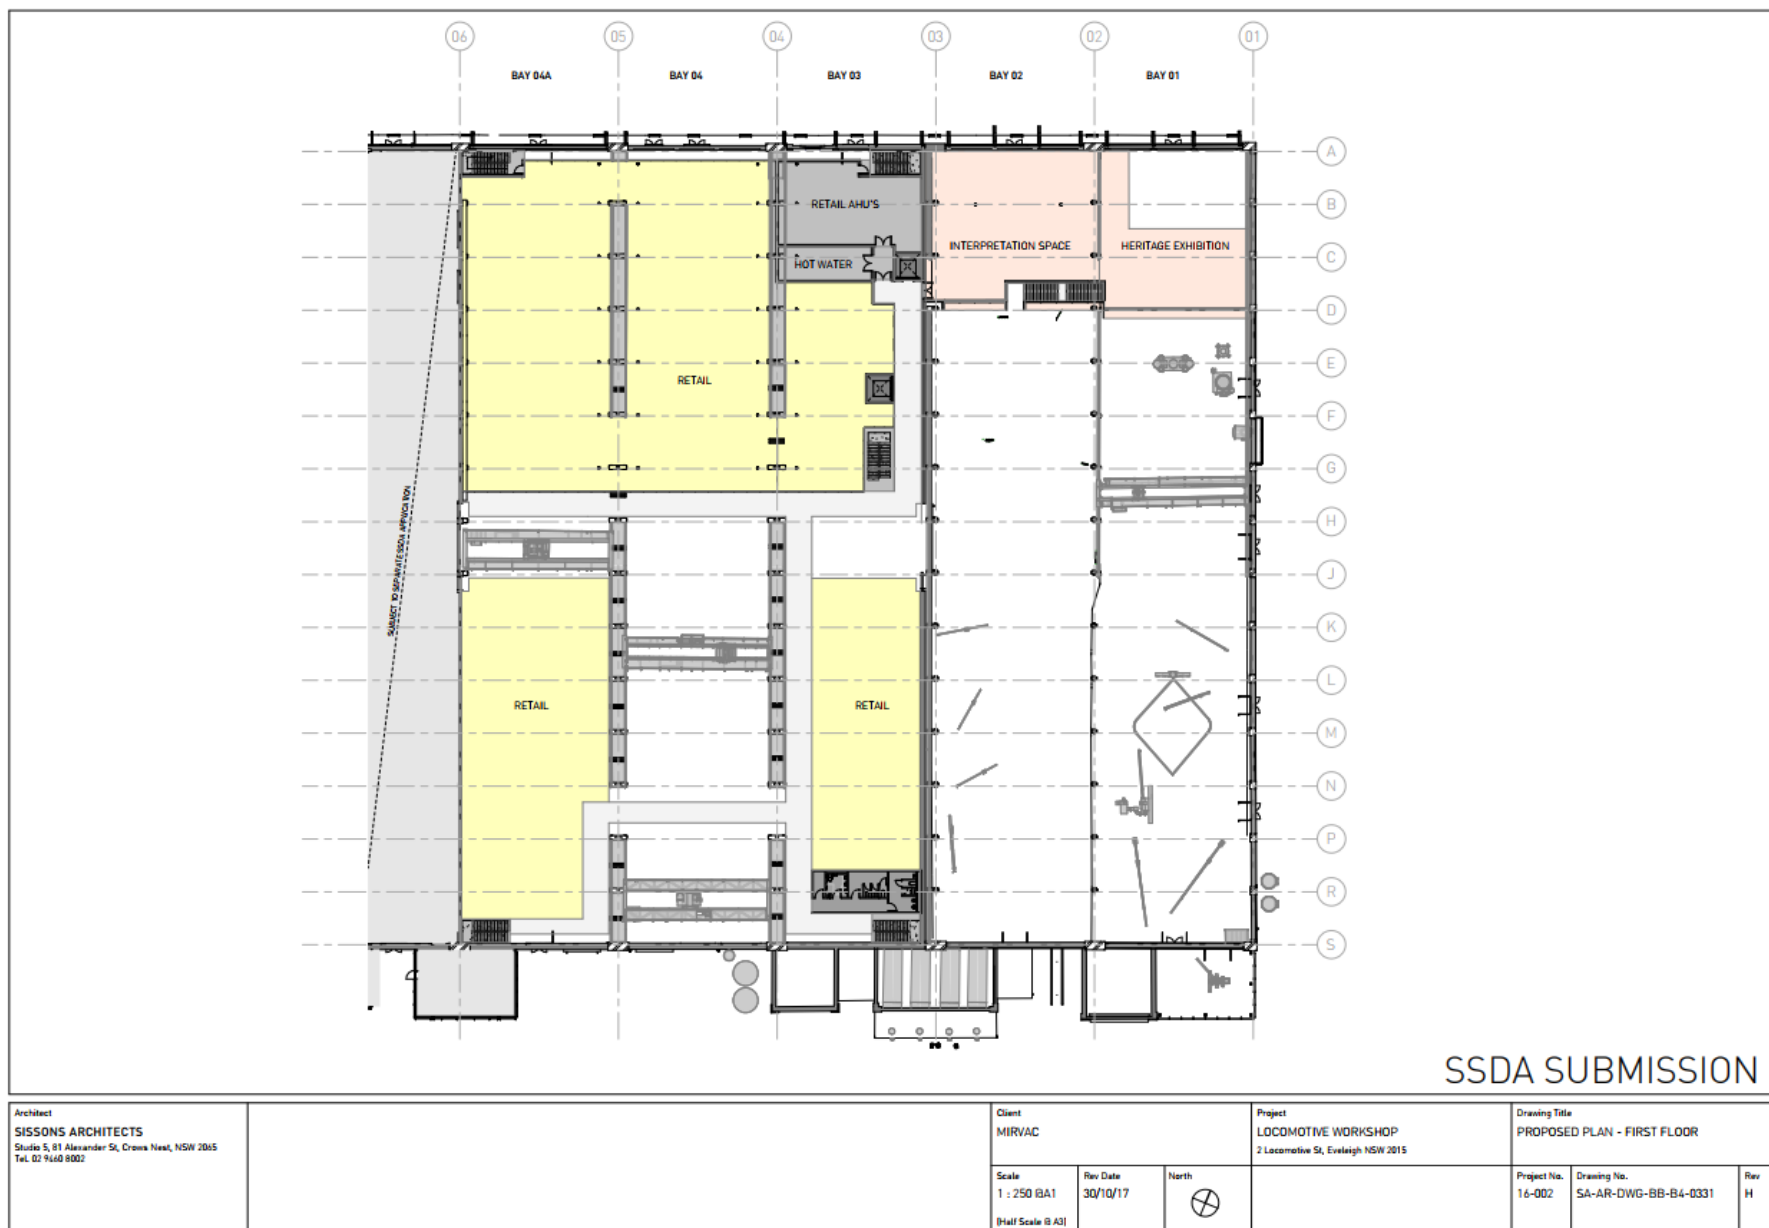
PROPOSED PLAN—FIRST FLOOR (SOURCE: SISSONS, DRAWING SA-AR-DWG-BB-B4-0331, REVISION H, 30.10.17)
